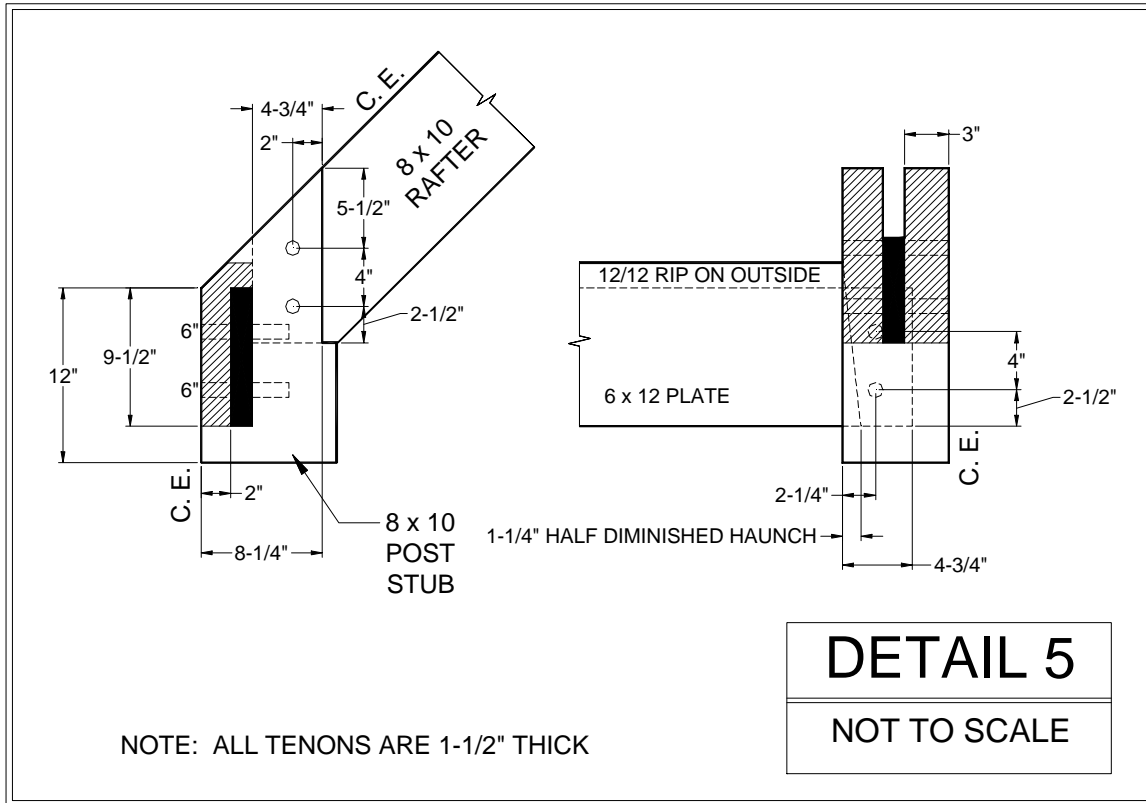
Example of typical end rafter, post stub and plate joint consisting of a tenon cut into the rafter which fits into a mortise in the post stub and a half diminished haunch and tenon cut into the plate which fits into a mortise in the post stub. The joint is secured with 1 in. diameter red oak pegs. (The 6" demarcations refer to the length of the pegs.)
